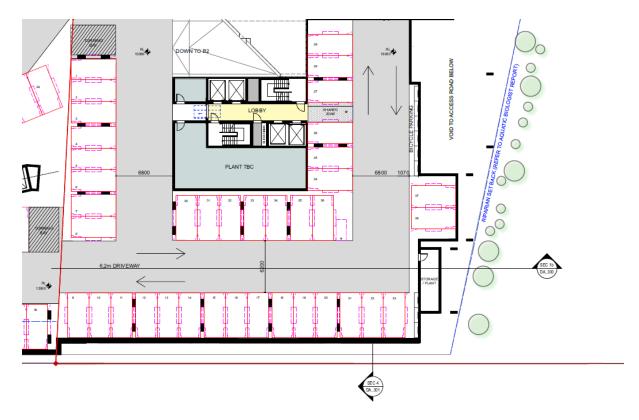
Amended Ground Floor Plan (Source: Drawing No. DA\_102 – Bennett Murada Architects)
